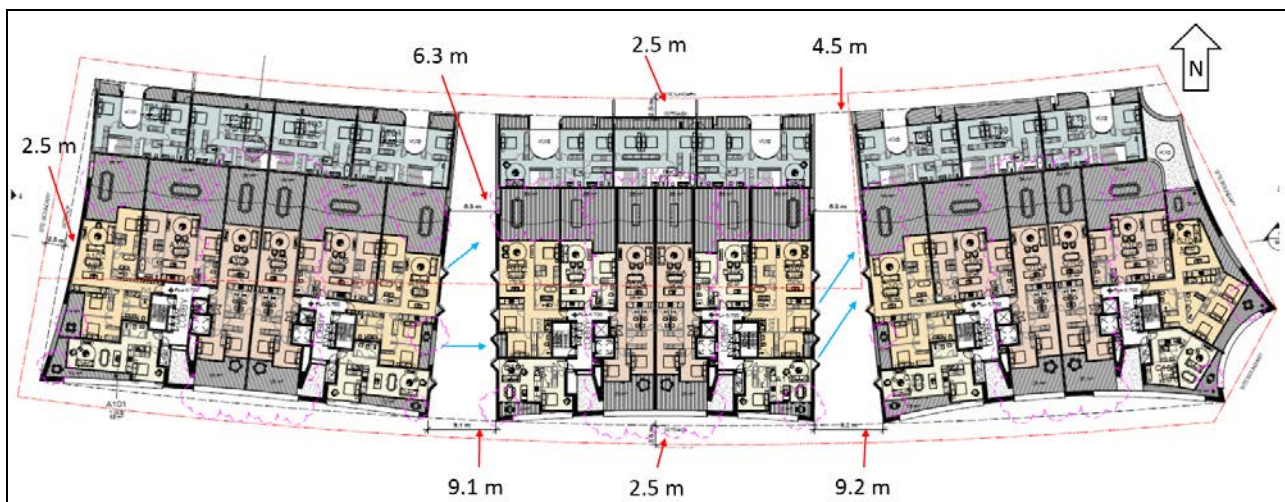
Level 1 floor plan showing building separation distances (in black) and window / balcony placement and orientation (blue arrows) (Source: Applicant's architectural plans)
